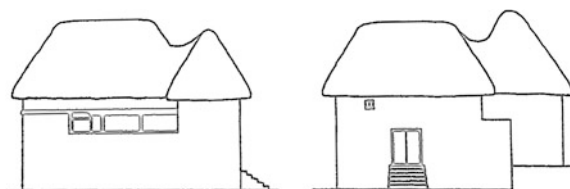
Section drawings of the Chen Family House in Nikubu Village, Yuanyang County. In structure, the Hani mushroom house is made up of a stone foundation, mud walls, wooden pillars, wooden beams and roof, and wooden or bamboo purlins with straw or tiles above. A mushroom houses generally falls into two parts: one-story flat-roof part and two-story sloped-roof part. *Source* Lu (2003a: 1244)
